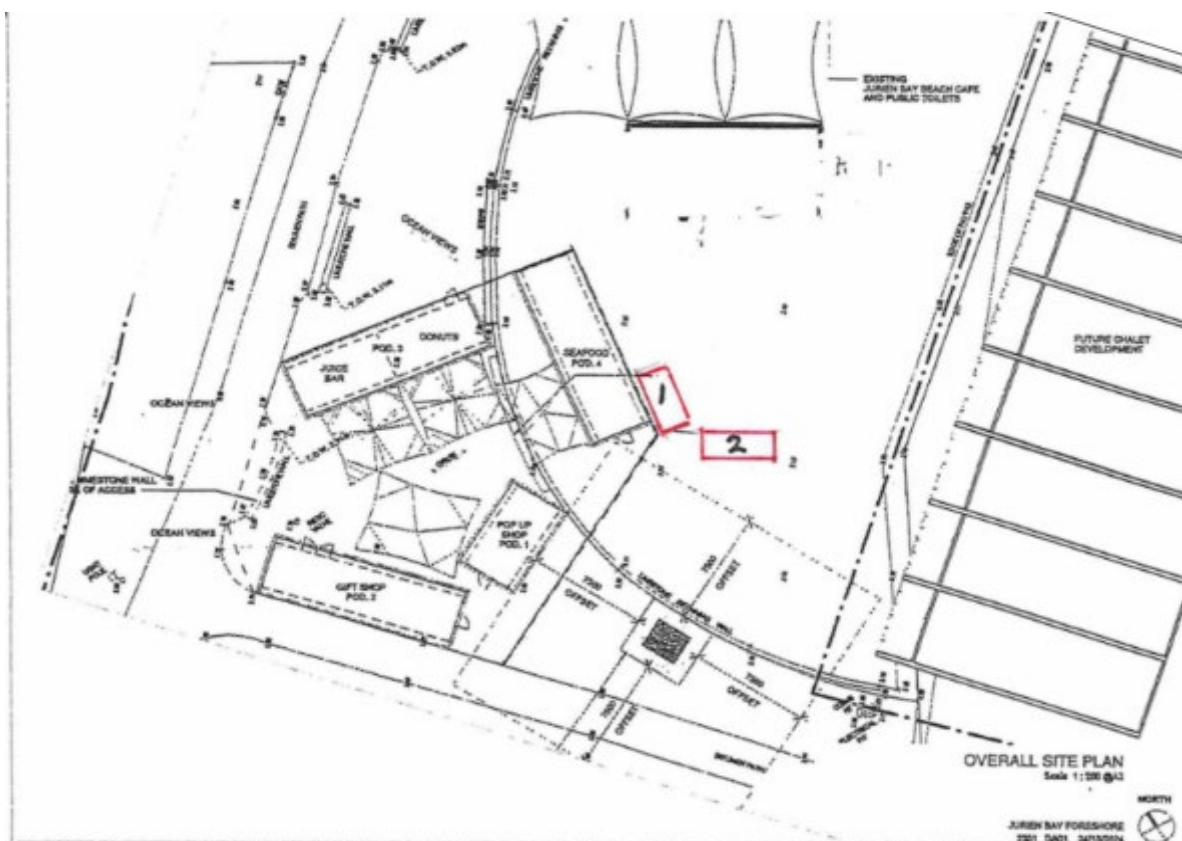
Site Plan 1: Applicant's proposed trailer location in red
